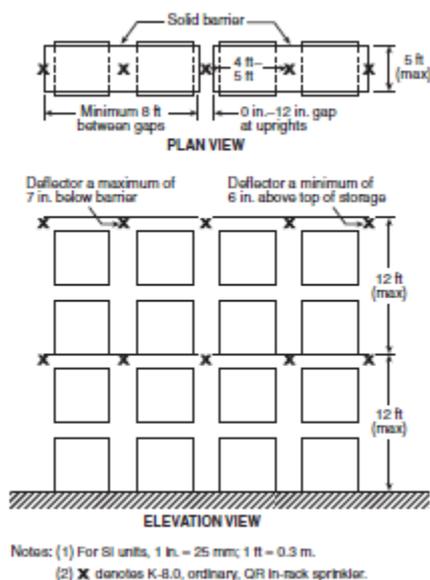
(b) Double-Row Rack Sprinkler Layout for Design Scheme "A."
